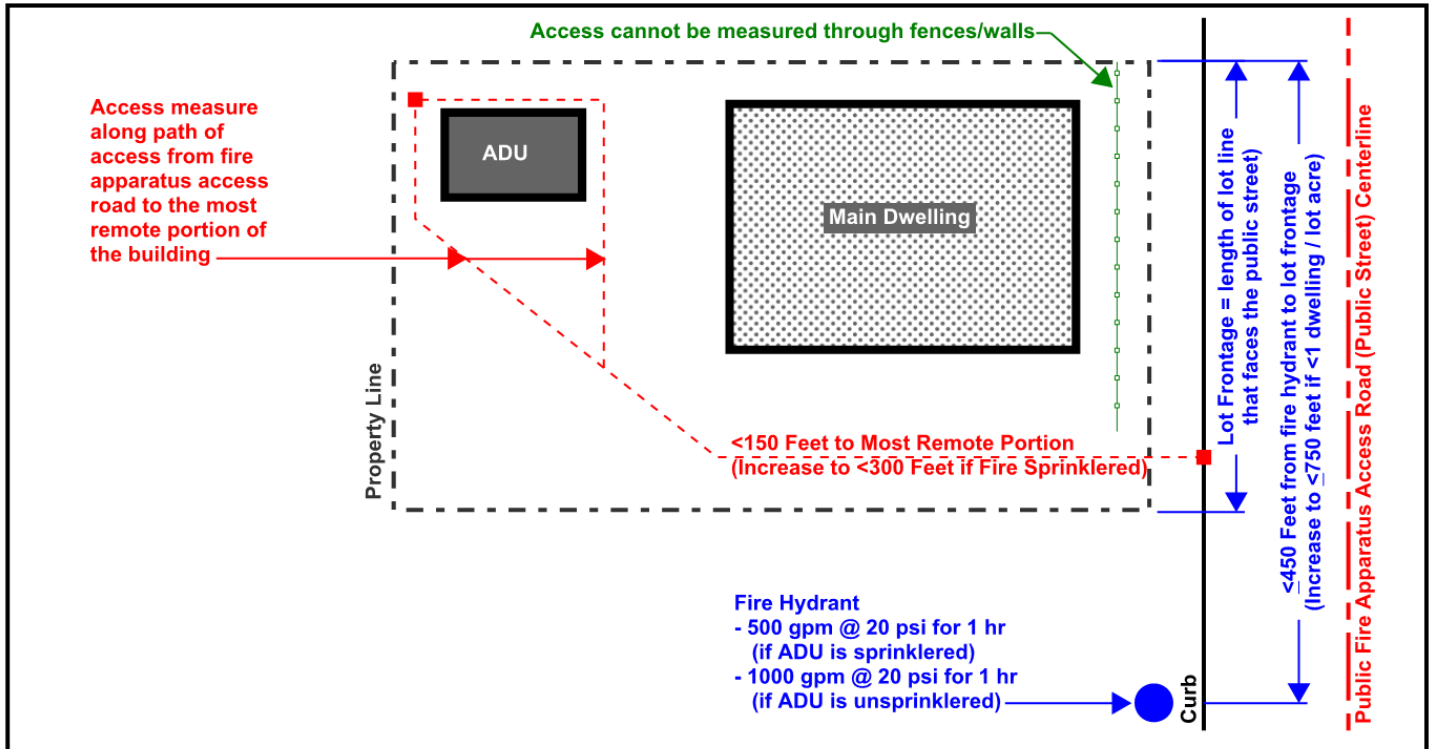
ADU Access From Public Fire Apparatus Access Road (e.g., Public Street)
